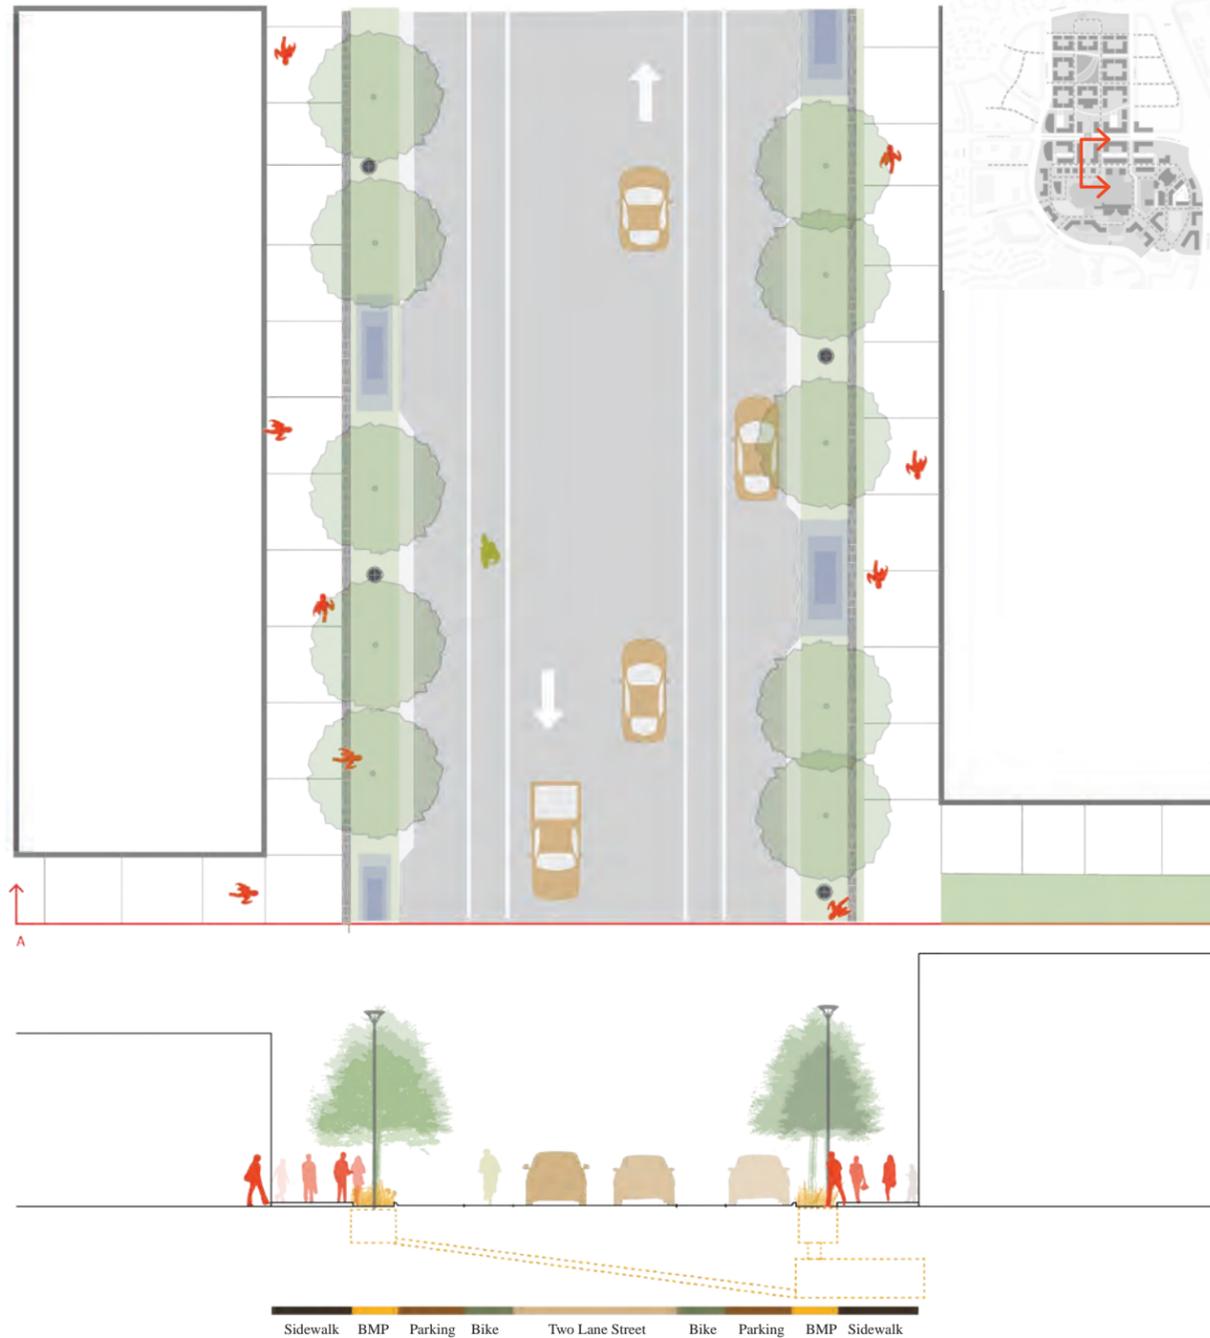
Secondary Street - Section and Plan, Typical (i.e. Pedestrian-Friendly Shopping Street)
